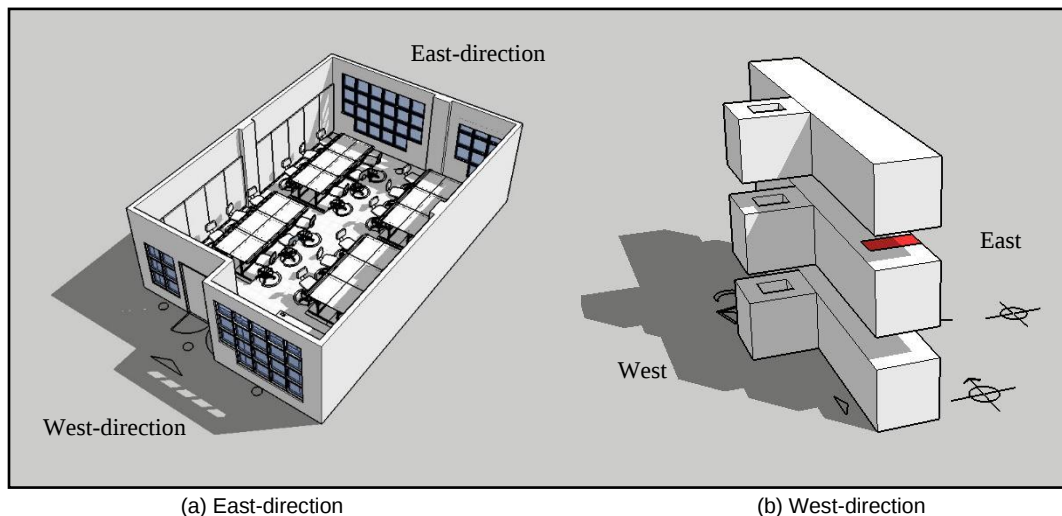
Elevation Drawing and Opening Types Drawing for Model
